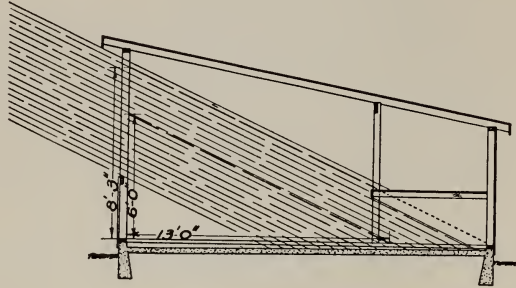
Showing how the height and vertical length of the front openings affect the amount of sunlight that enters a poultry house in December and the distance it extends back toward the rear wall.
